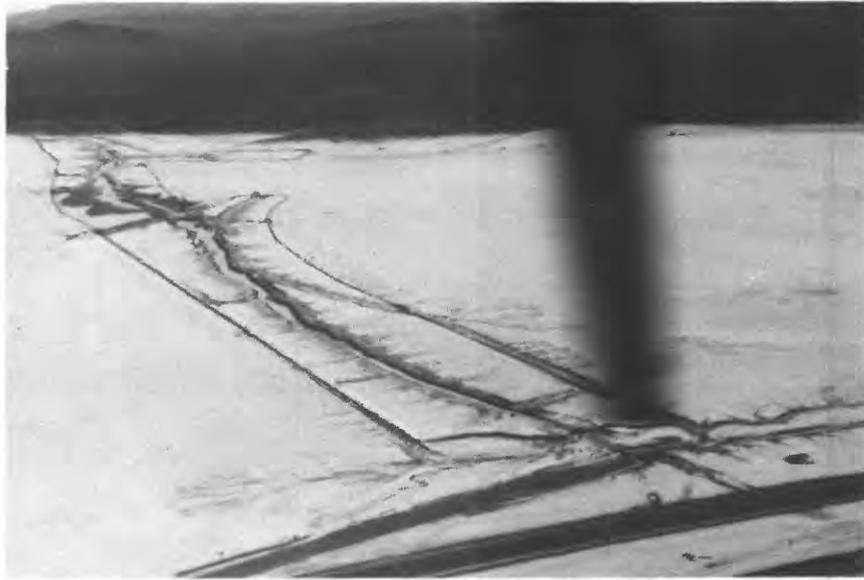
Northeasterly view of the 1969 crack showing erosion of drainageways along the berm and into the crack, May 1982. (Dark shadow at right side of view is blade of helicopter rotor; paved road is in lower right of photograph; crack is partly filled with water.)
